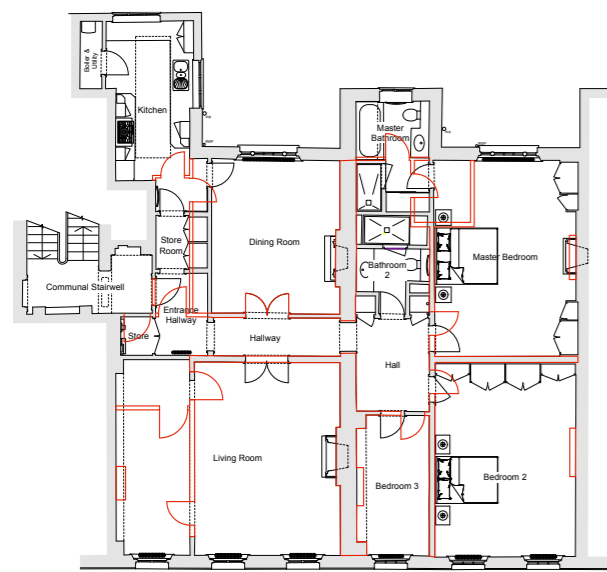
Existing Floor Plan with the 1949 Floor Plan overlaid in red.
